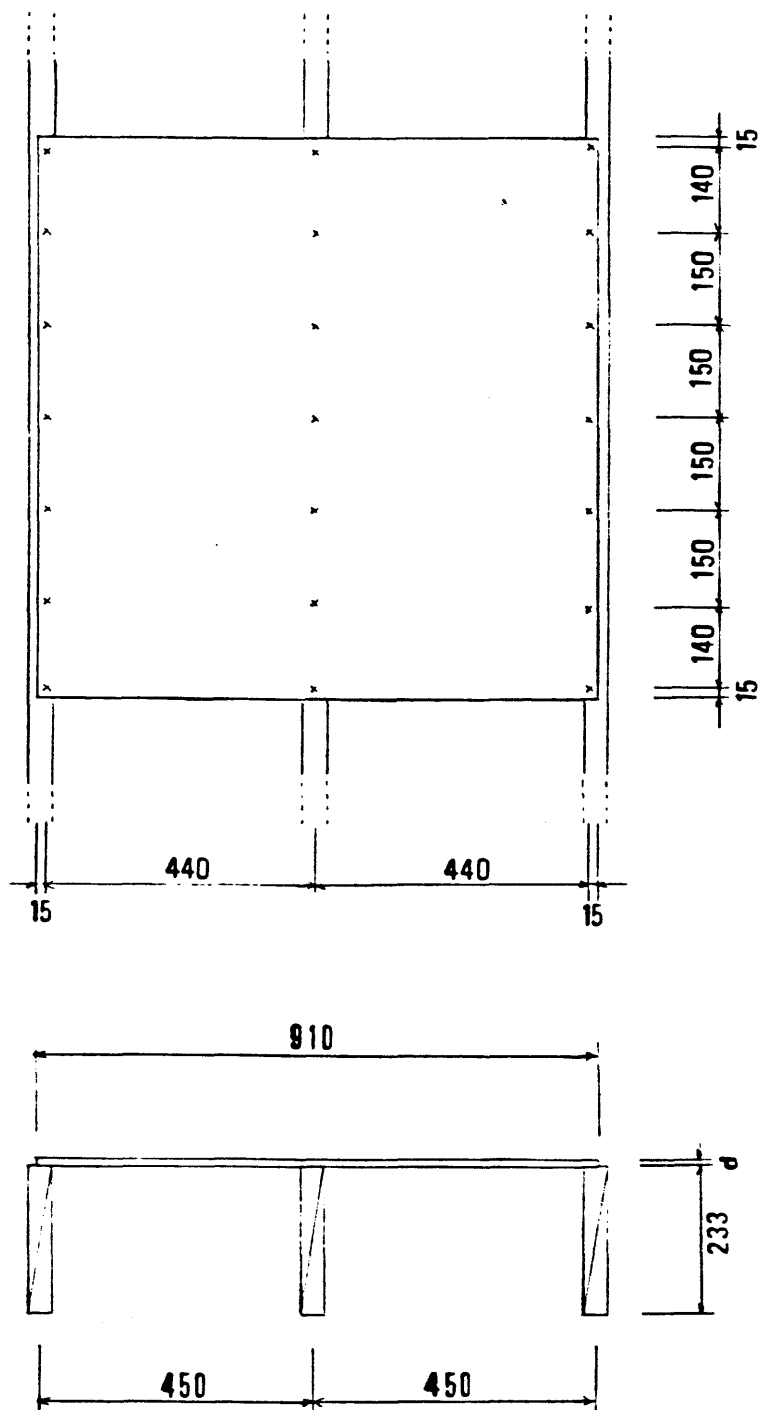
3 3 Nailing of board and cross-section of spesimen.
